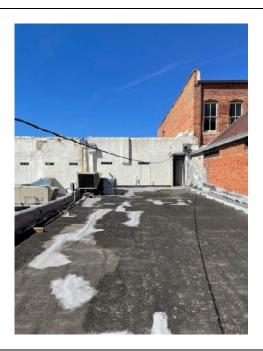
Parapet walls extending above roof of 215 W. Lincolnway.
